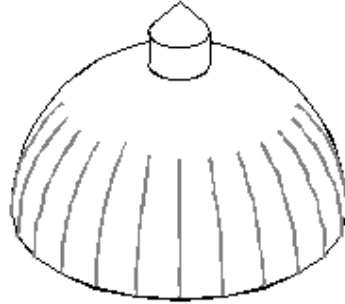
Typical meridian cracks in a masonry dome (Heyman, 1995)
